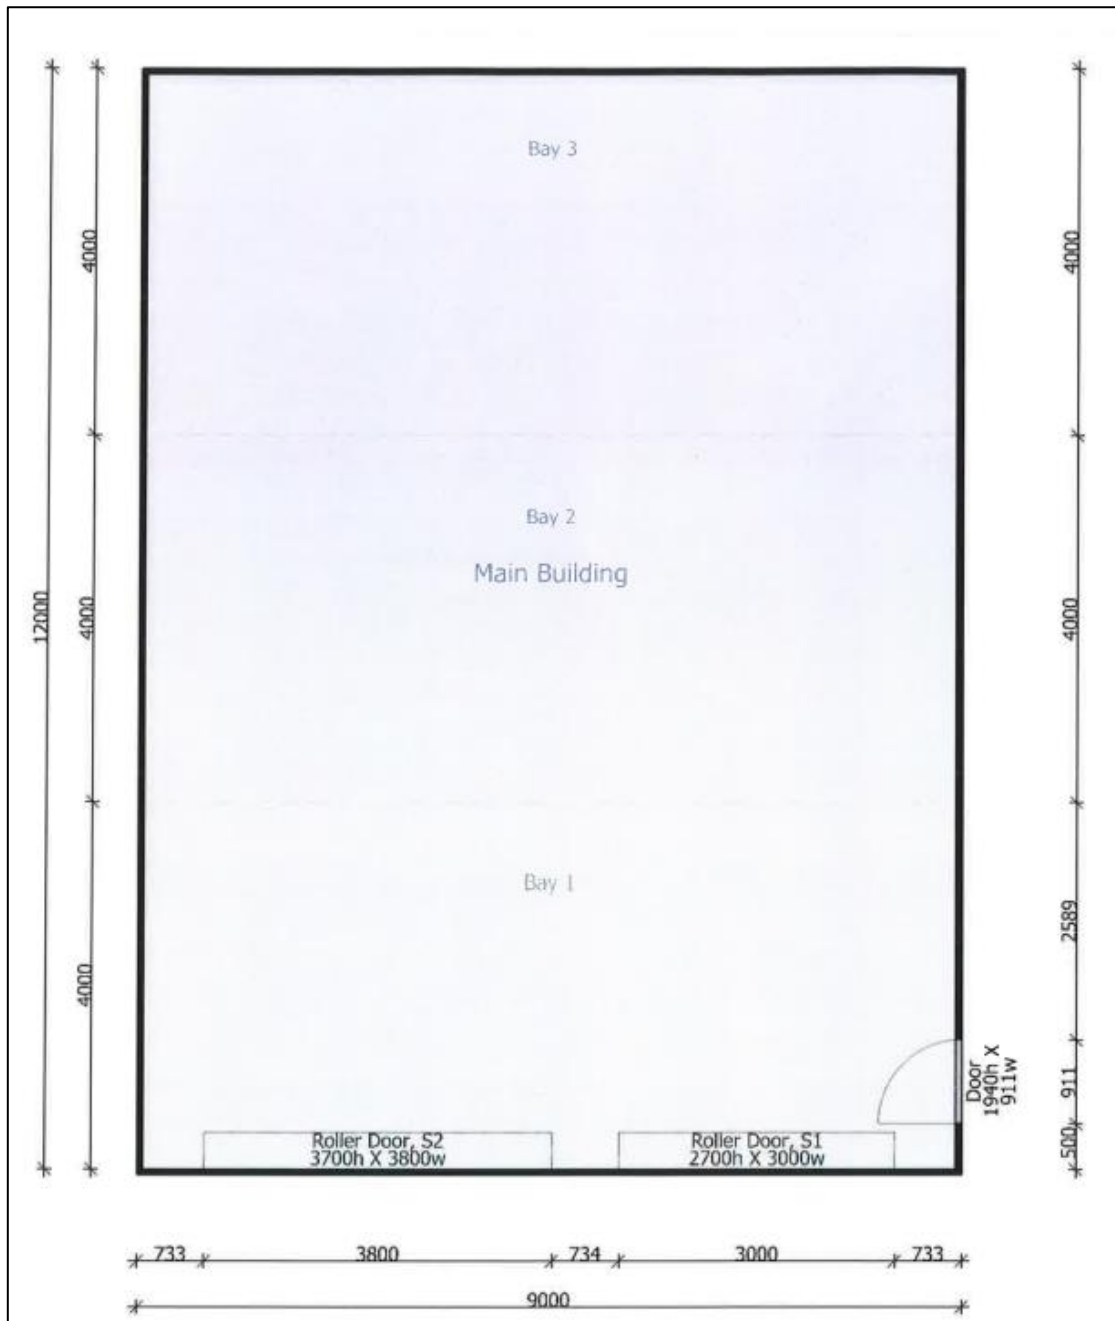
Snip of Proposed Shed Plan by Totalspan Bol & Hokianga (Proj No. CN120 dated 04.04.2024).
